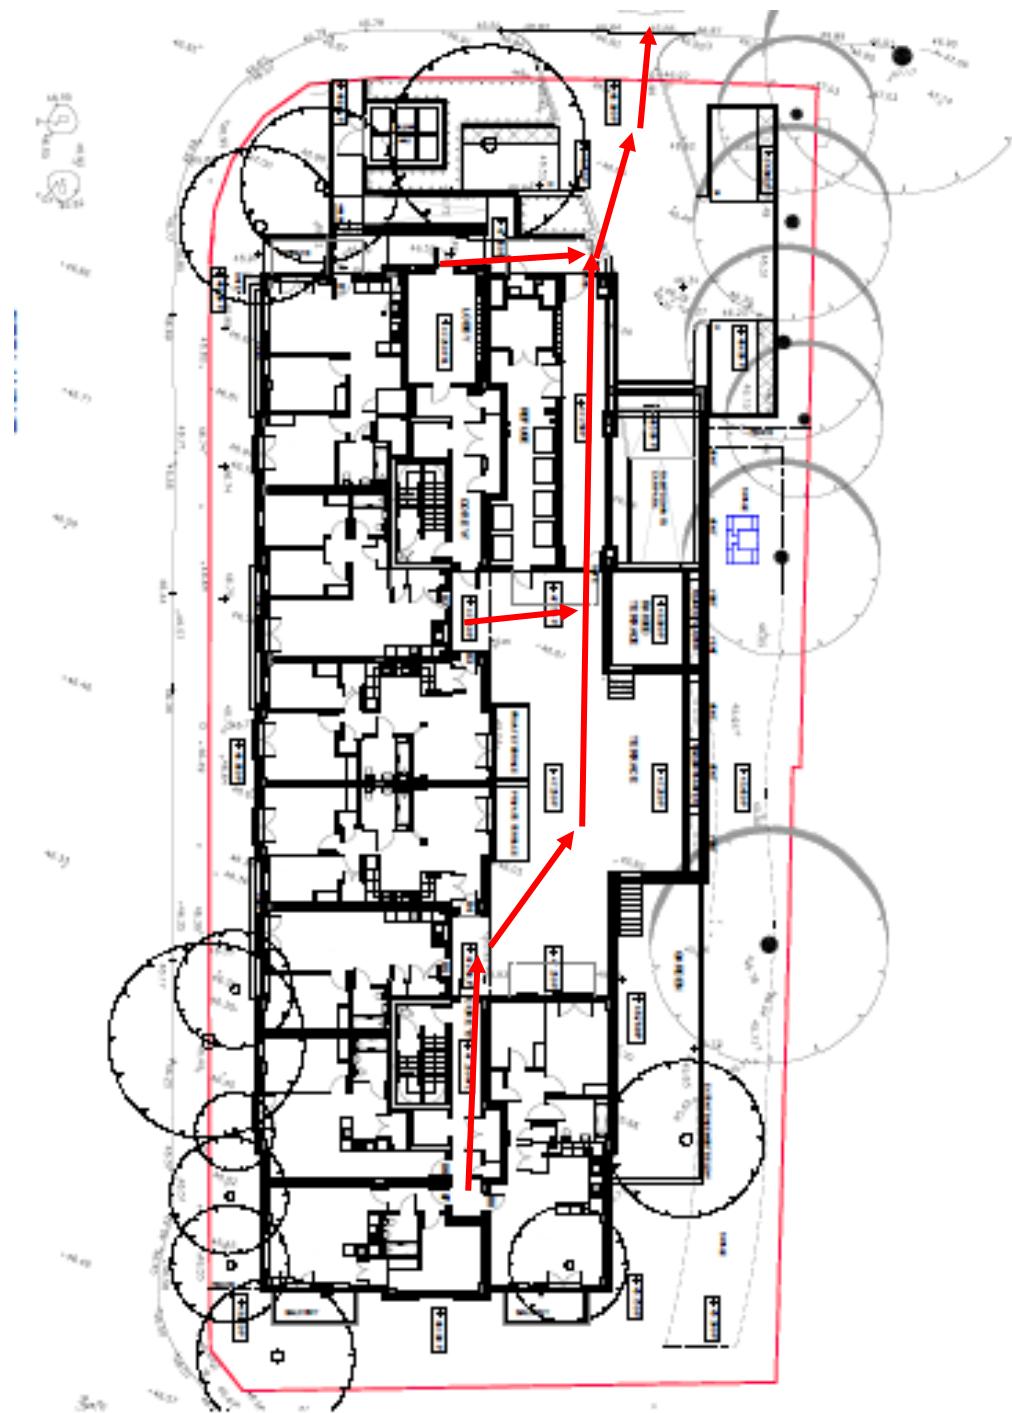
Evacuation Route from Fanuc House Ground Floor to Pembroke Road
